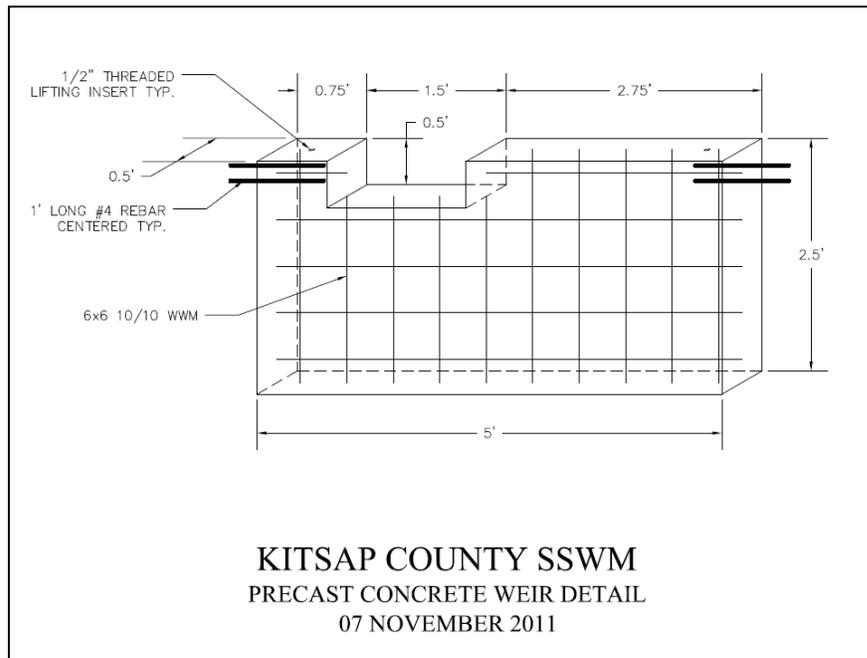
Check dam structure (Hard or Cascade style)
